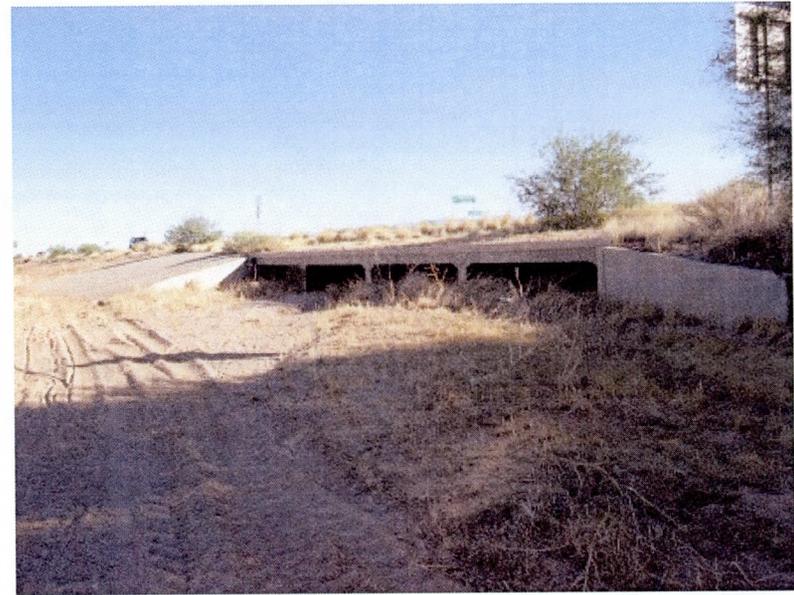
Looking NNW at the south end of the culvert listed in picture 234.
